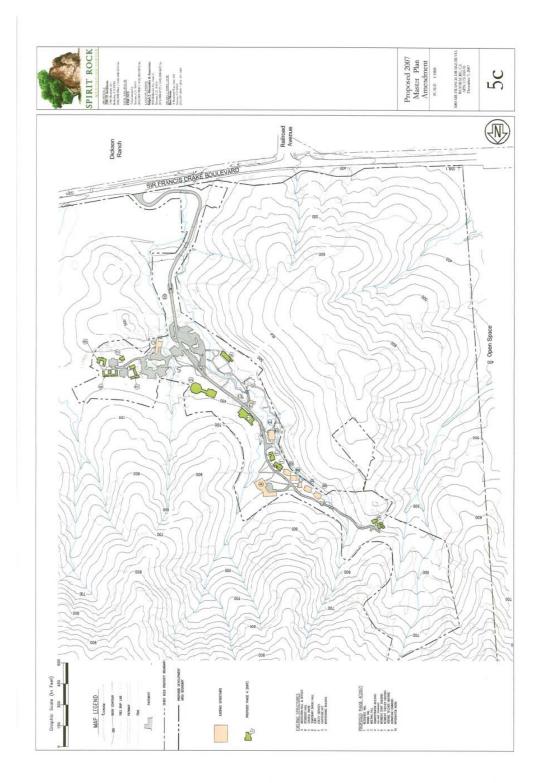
PROPOSED MASTER PLAN AMENDMENT (PLAN SHEET 5C)
